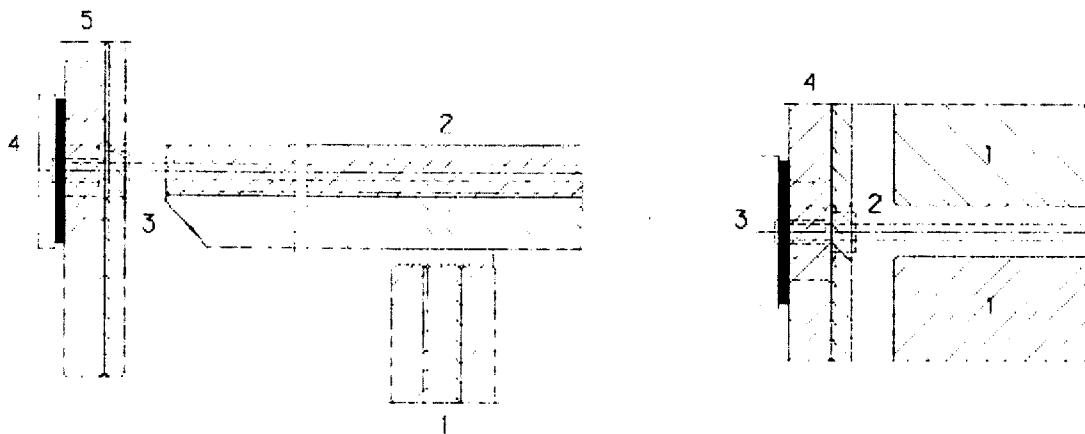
a) Elevation of connection details b) Plan view of connection detail [30]
